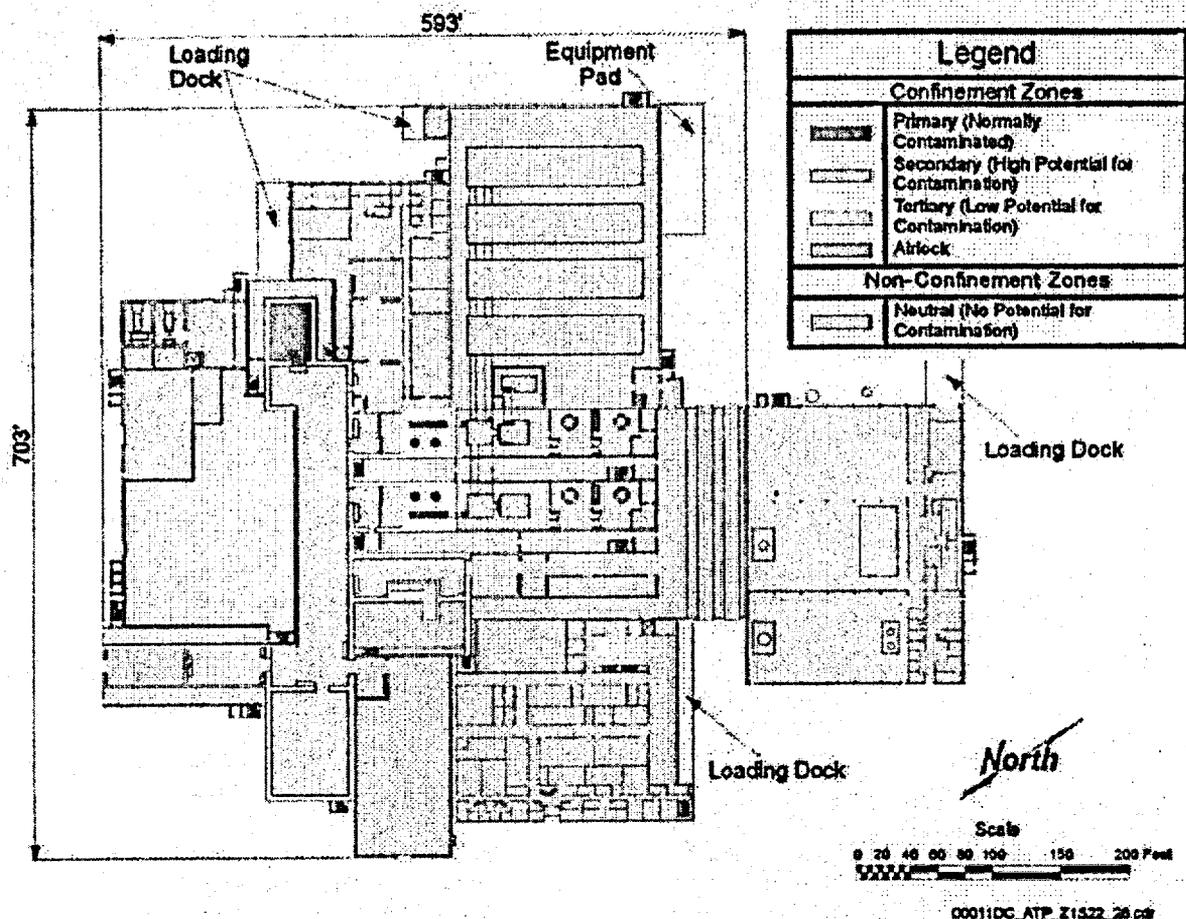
Waste Handling Building Confinement Zone Configuration
